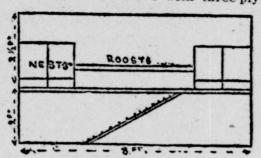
Cross Section from side to side showing nets, roosts, etc. boards and two of building paper, the rest with two piles of boards and one
